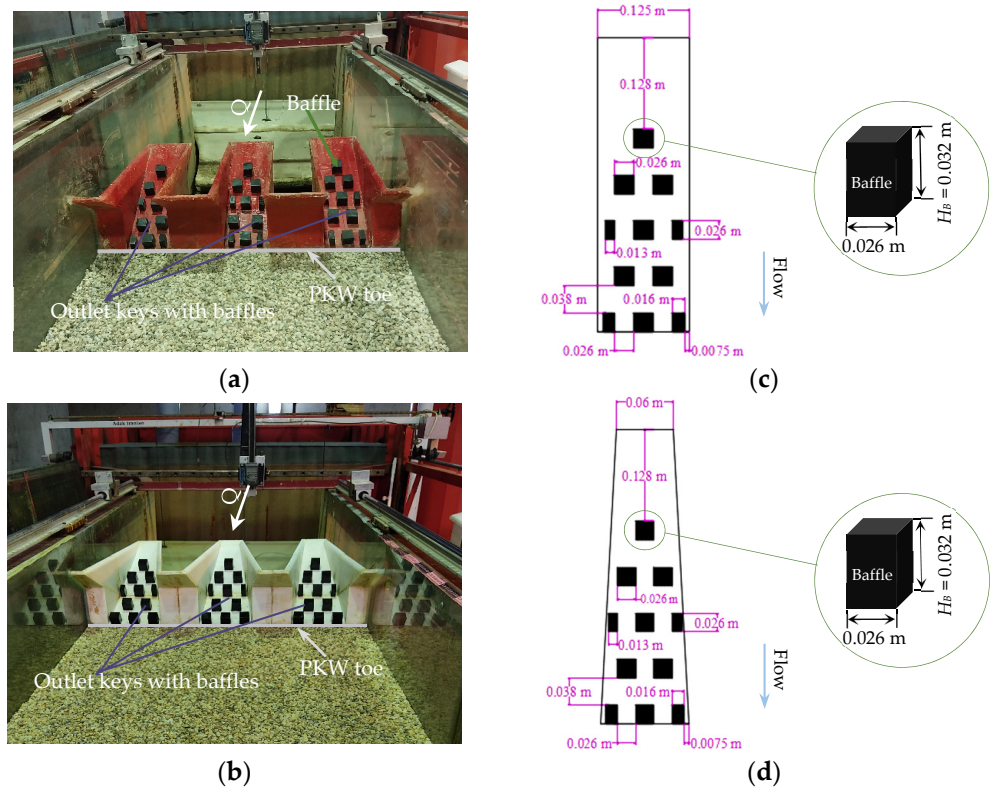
Baffles in PKW outlet keys: (a,b) photo from downstream of RPKW and TPKW; (c,d) dimensions and layout of RPKW and TPKW.
